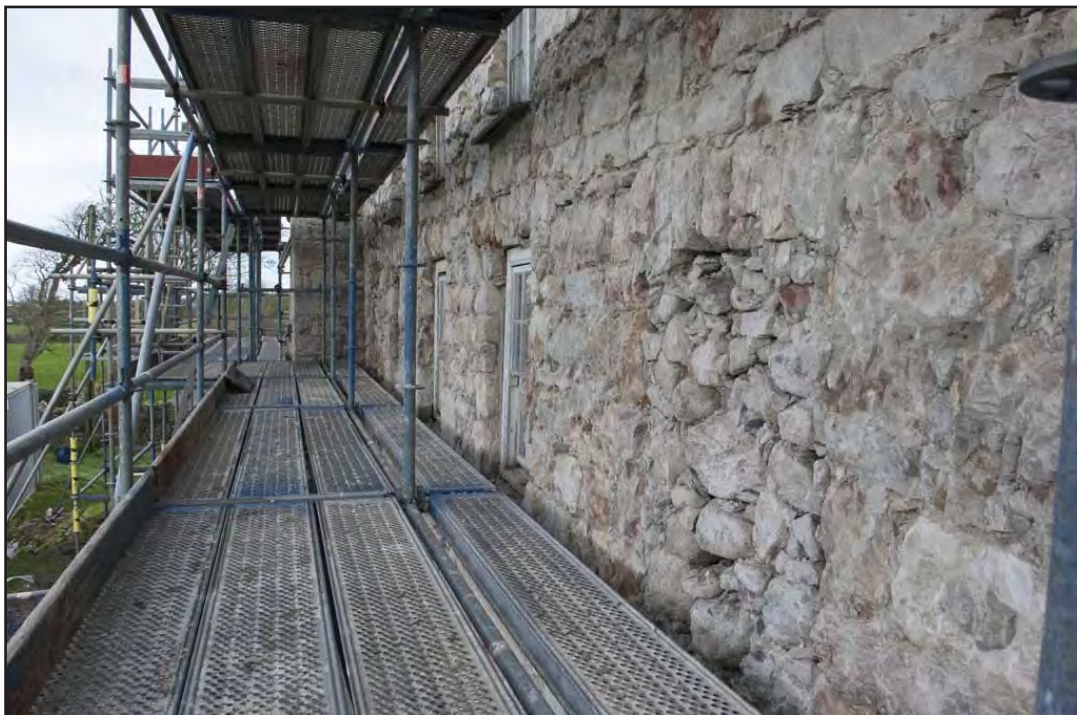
Front elevation - oblique view of blocked former window at first floor level (archive image: G2483\_205).
